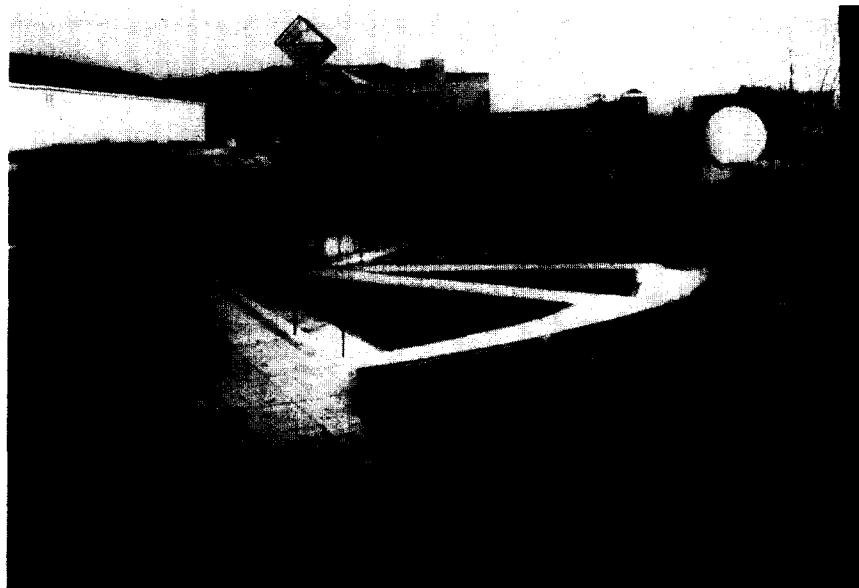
Entrance plaza and west elevation of the University of Minnesota's Civil and Mineral Engineering (CME) Building.
